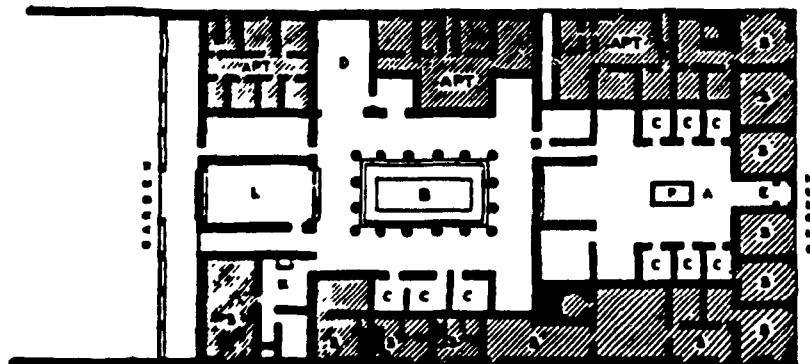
Early Roman Houses and Late Roman House - Plan of House of Pansa.
